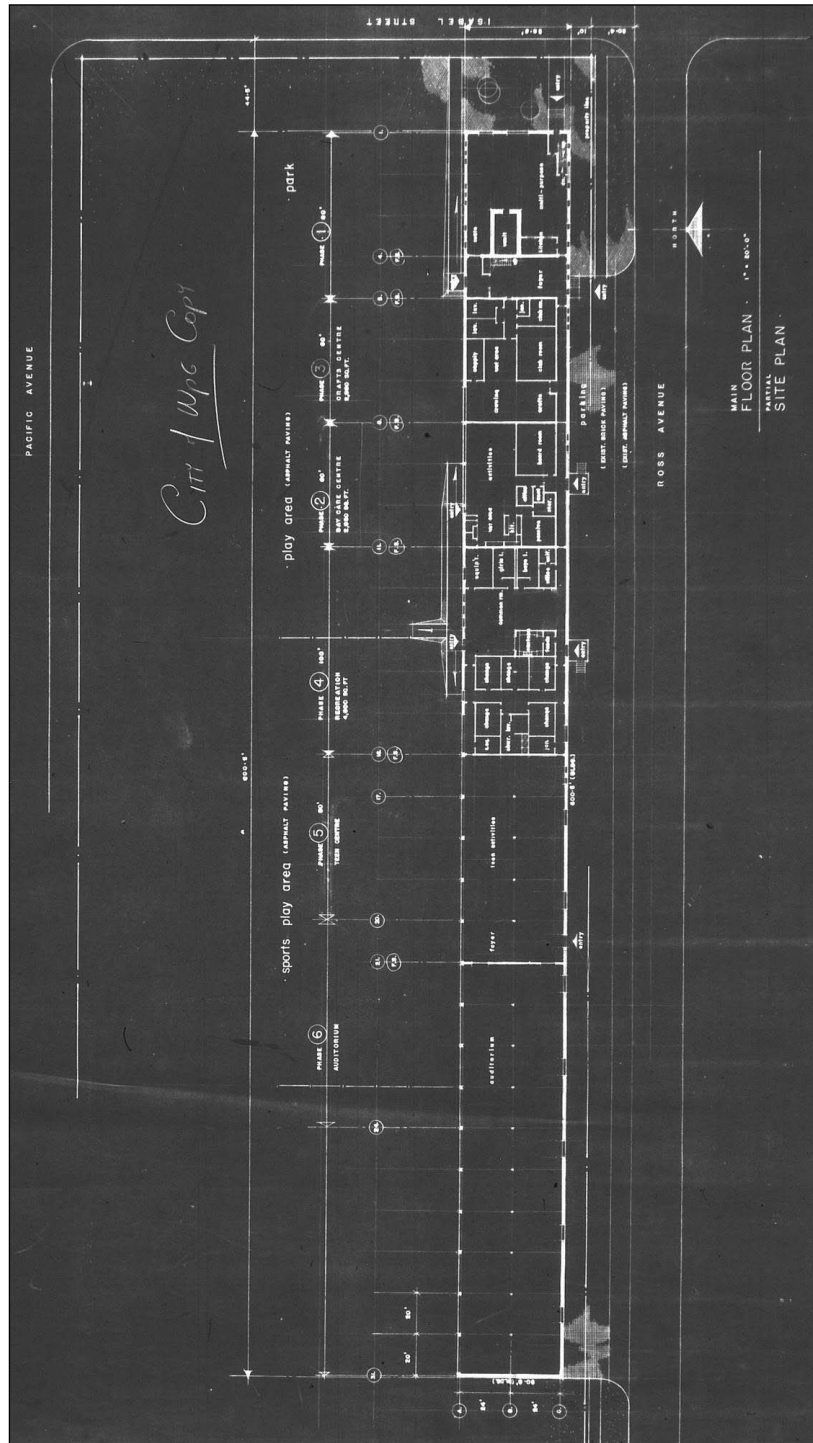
“Main Floor” and “Site Plan,” architect’s plans #9440/1975. (City of Winnipeg, Records Management Division.)
